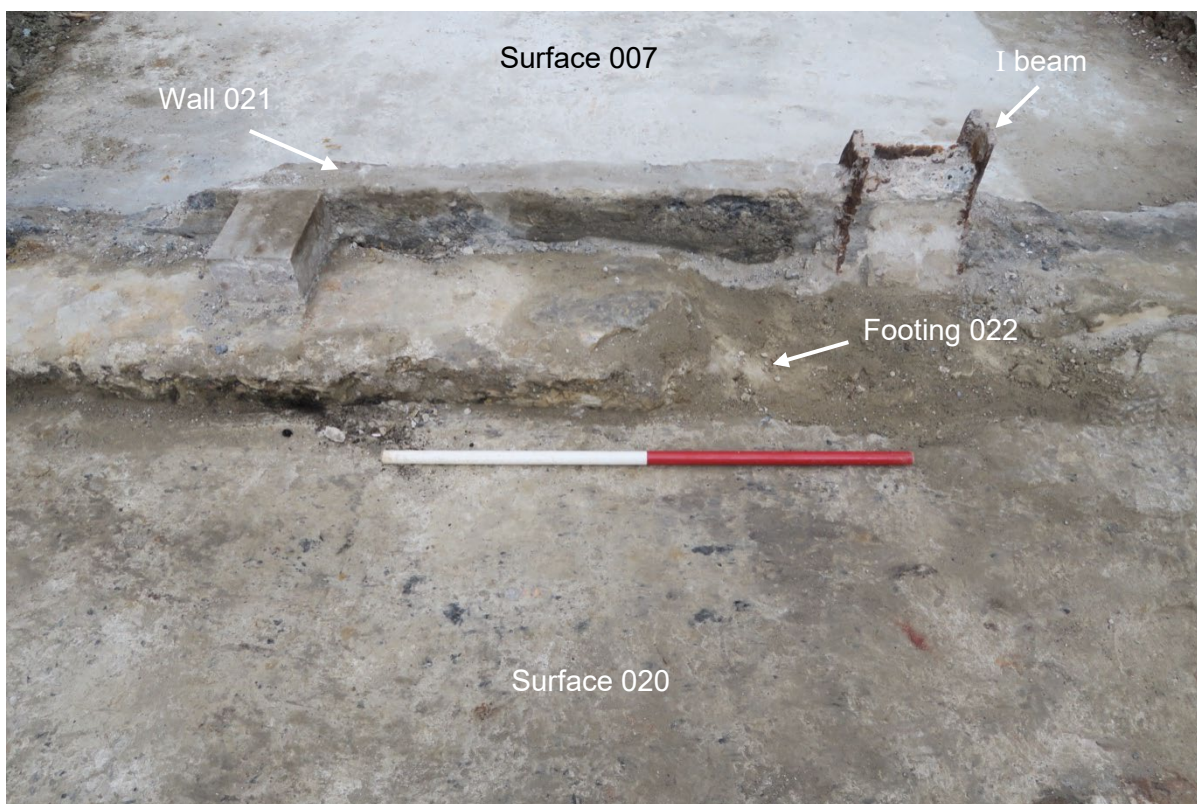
Detail of wall (021 & 022) and the iron girder. View to west, scale 1m. IMG\_7044.
